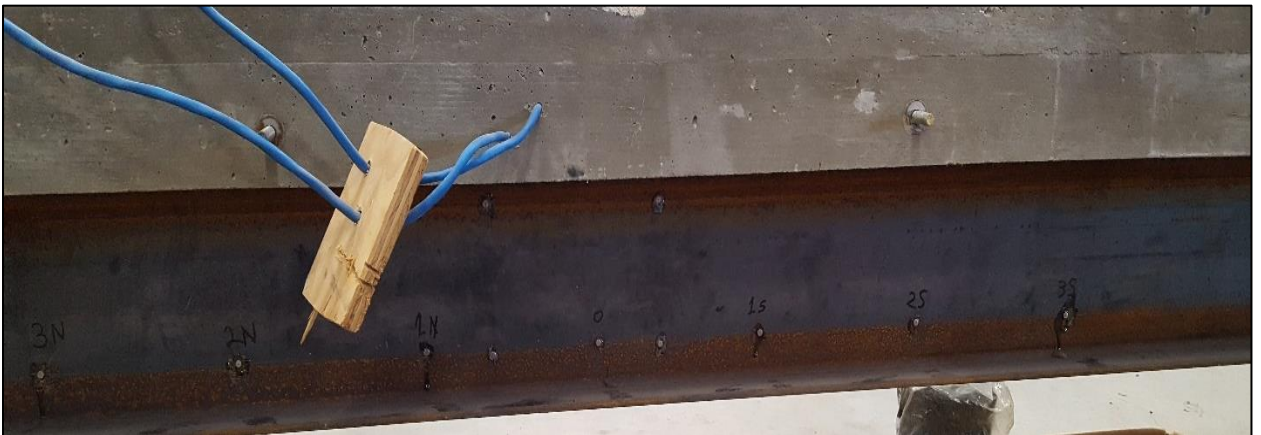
DEMEC points location on the web of the steel girder for Porotype Beam 2
